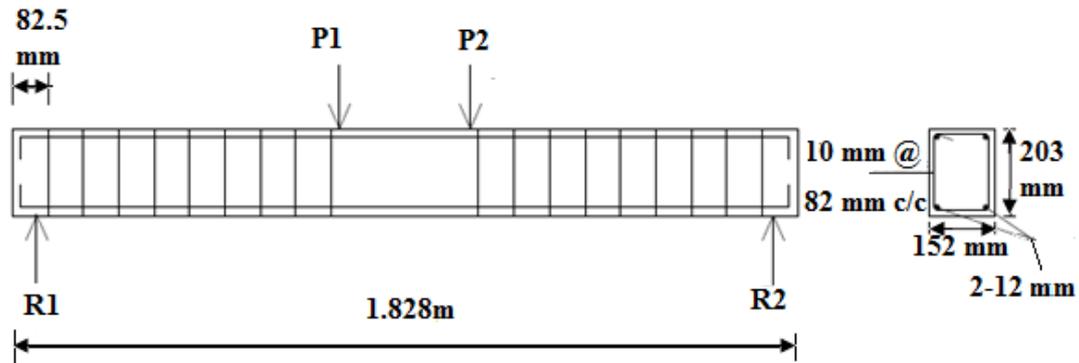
R/F details for ACI-1 beam with a/d ratio 4.27
